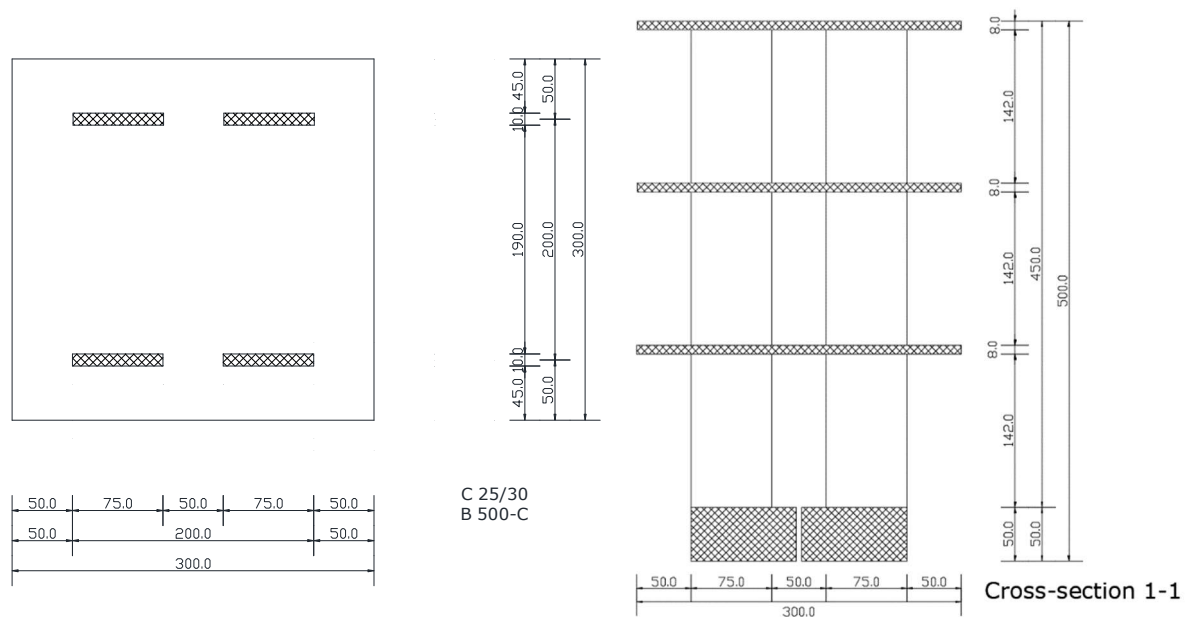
Geometry of the specimen with coupling beams - Typical floor plan (left), Typical cross-section (right)
